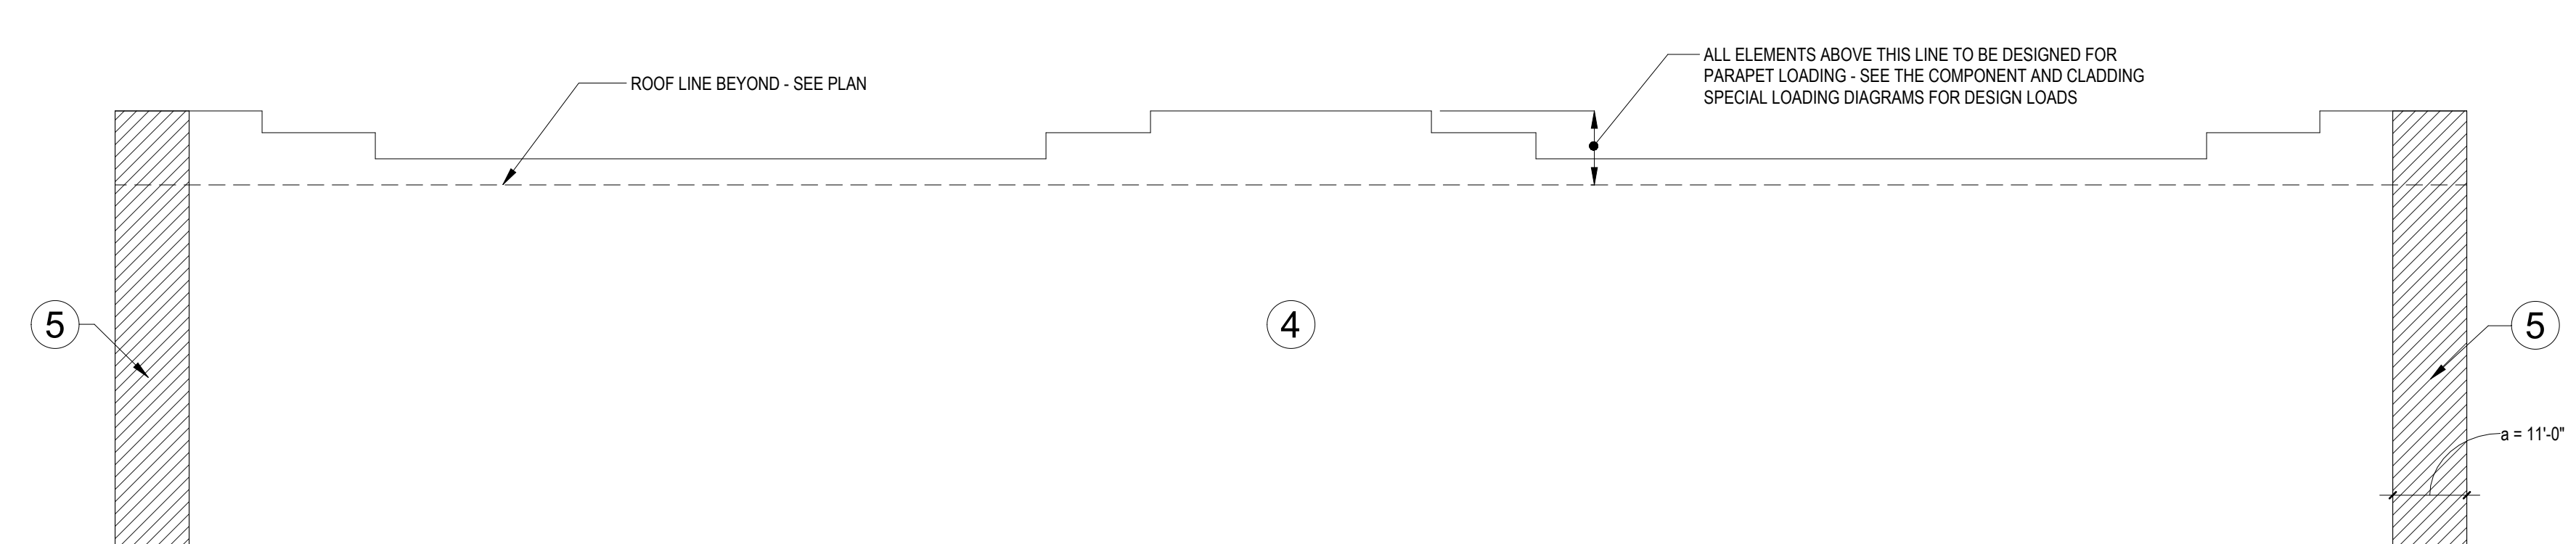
IMAGE BUILDERS - WGCC NEW CONSTRUCTION - IMAGE BUILDERS 690 GARDEN COMMERCE PARKWAY WINTER GARDEN, FL 34787 GENERAL STRUCTURAL NOTES
